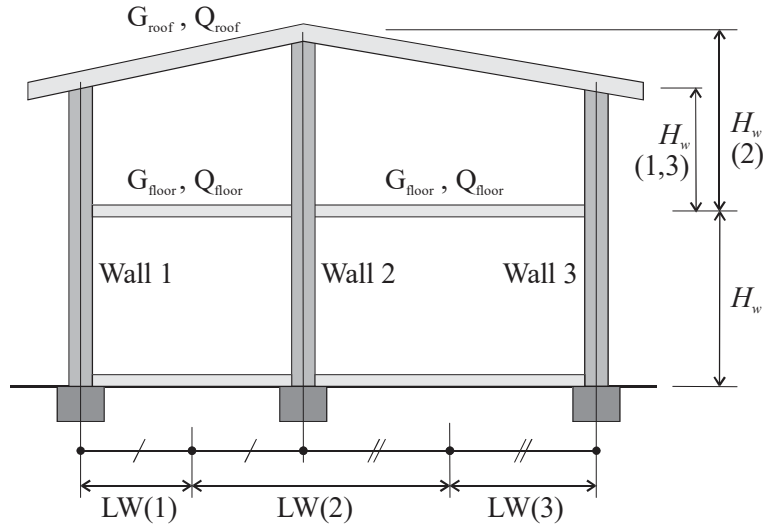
Overall building geometry, Two-storey ($n_s = 2$) double-bay building with internal and external walls, indicating the definition of wall height (H_w) and tributary load width (LW).
